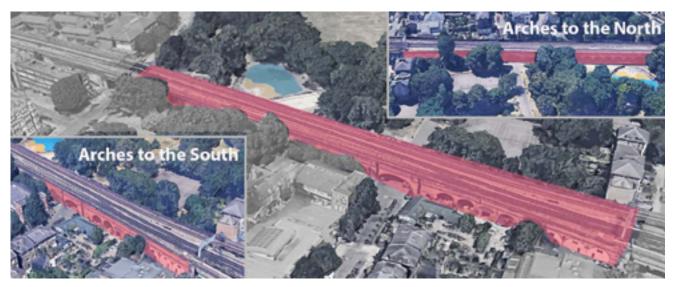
Location of arches between Ravenscourt Road and Ravescourt Park. Arches 108-132 (North side of the track) and Arches 112-116 (South side of the track)
